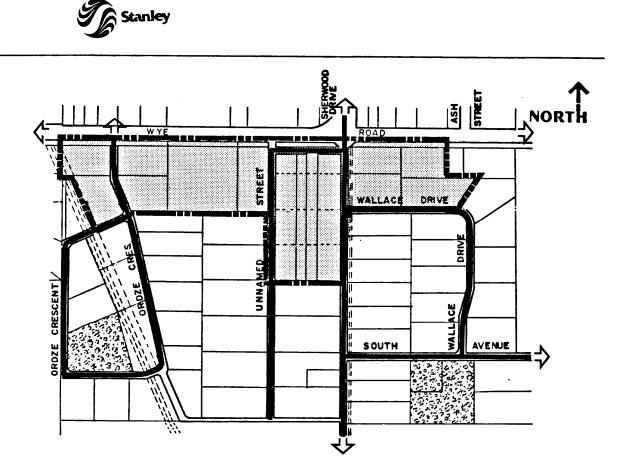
SITE AREA AND EXISTING ROAD SYSTEM
